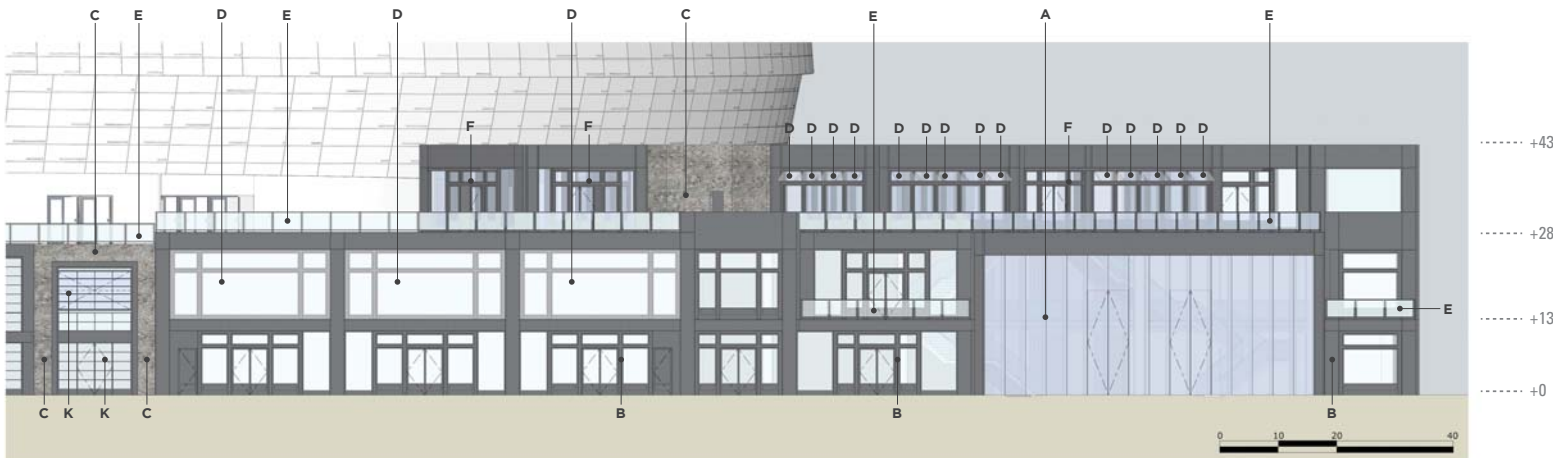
| FOOD HALL TERRY A FRANCOIS BOULEVARD ELEVATION
